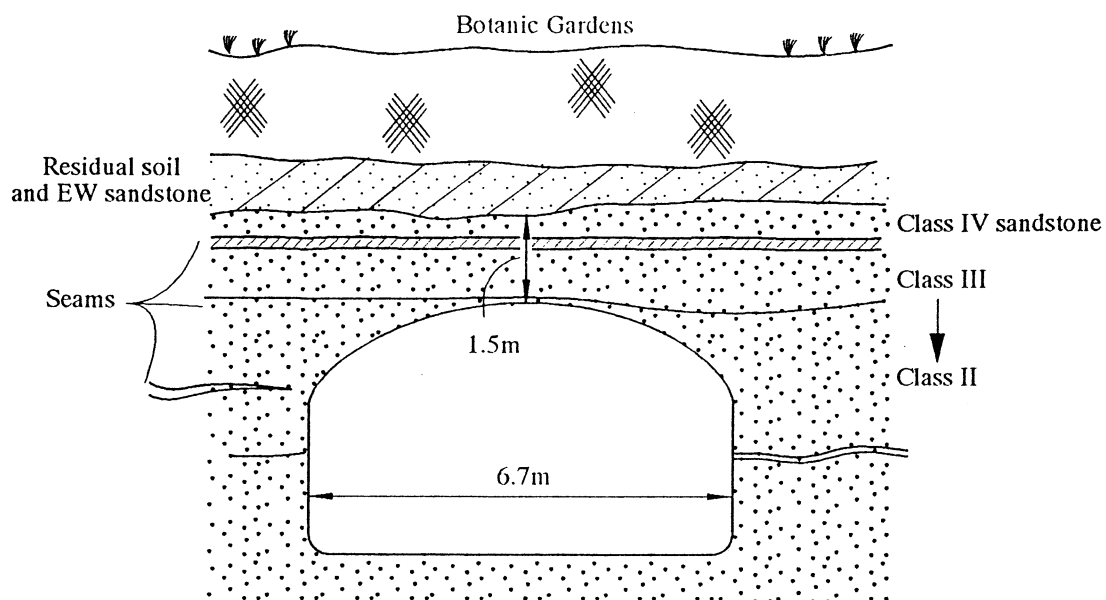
Rock Cover Over Bennelong Exit Tunnel Near Macquarie Street
